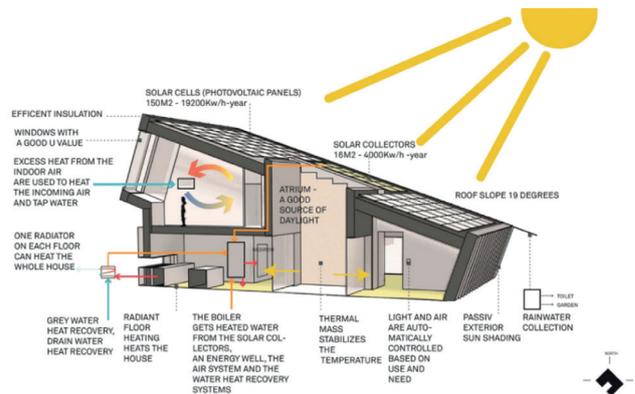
ZEB Pilot House - Pilot Project (URL- 15)
